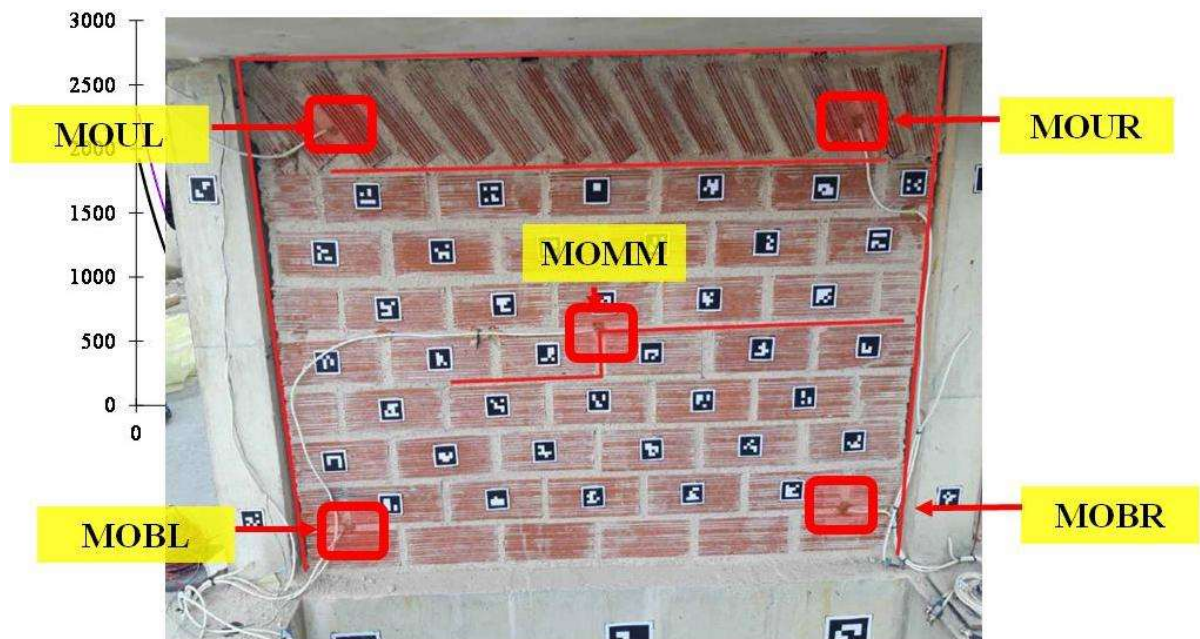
Observed damage after 1.1g test and location of PZT sensors on full Infill wall between columns 1-2
